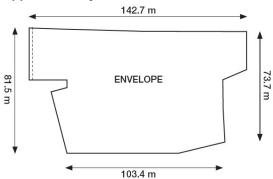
Block B site boundary Source: Woods Bagot & SOM architects
